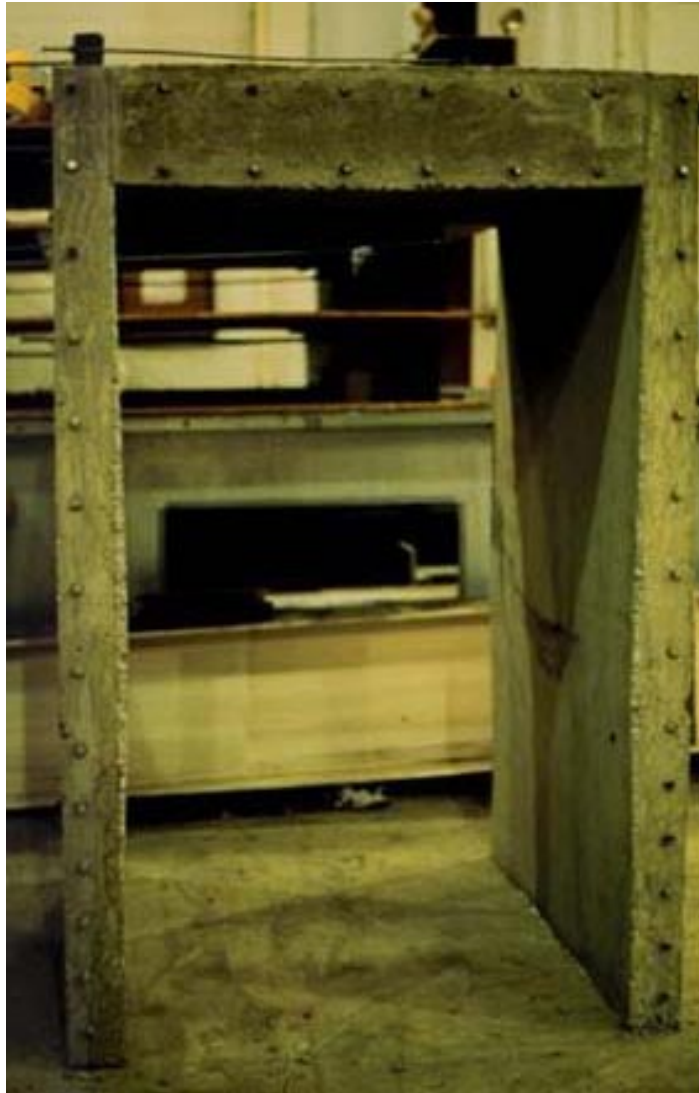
Typical specimen after Removal from the Steel Forms.
